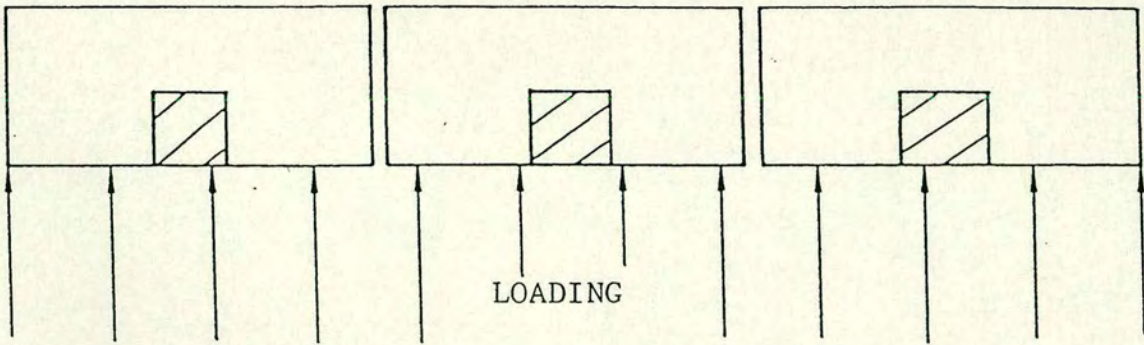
Beams 3-8 Test arrangement (Beam/slab)
